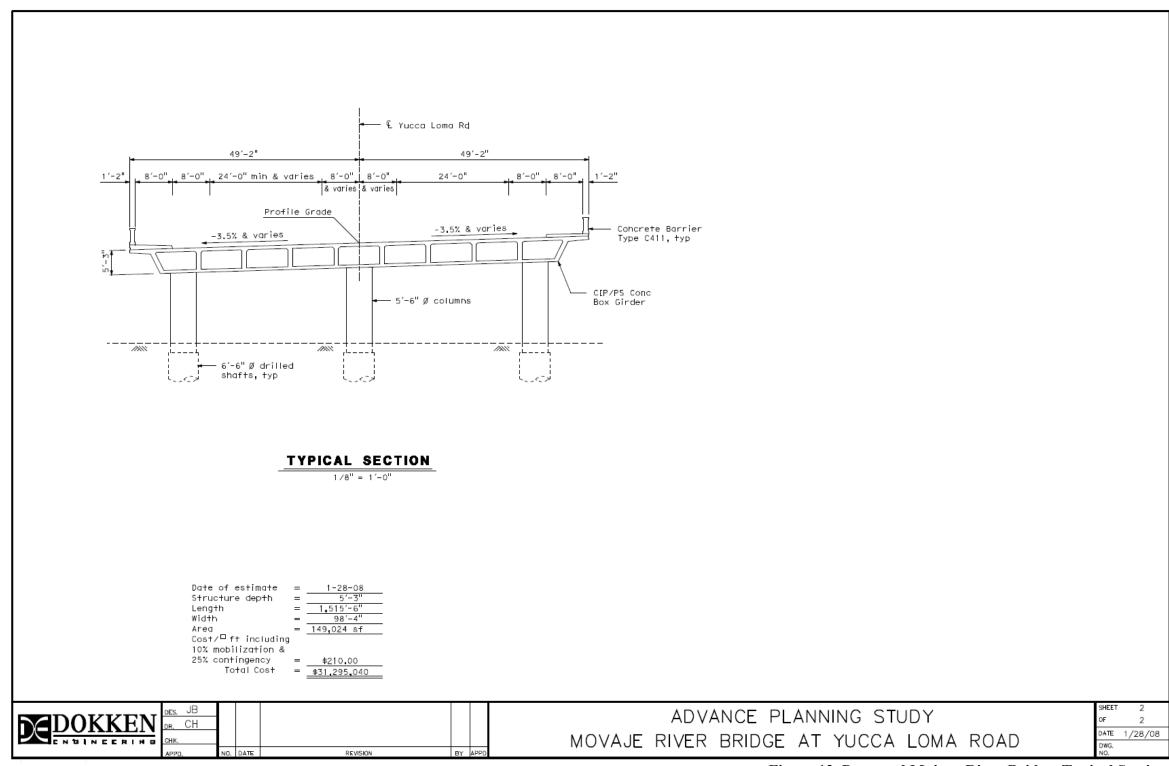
Proposed Mojave River Bridge, Typical SectionSource: Bridge APS
